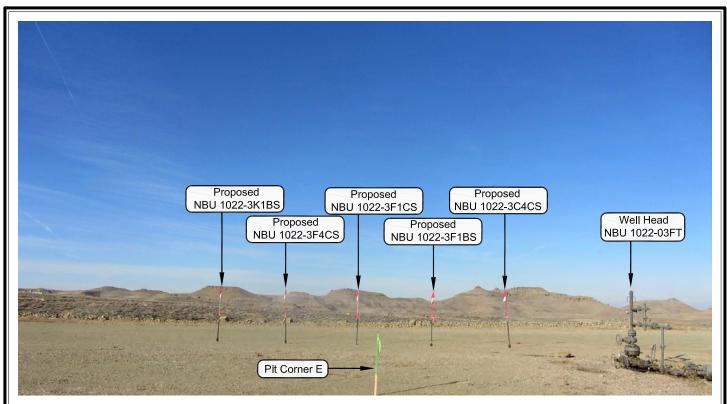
PHOTO VIEW: FROM PIT CORNER E TO LOCATION STAKE
